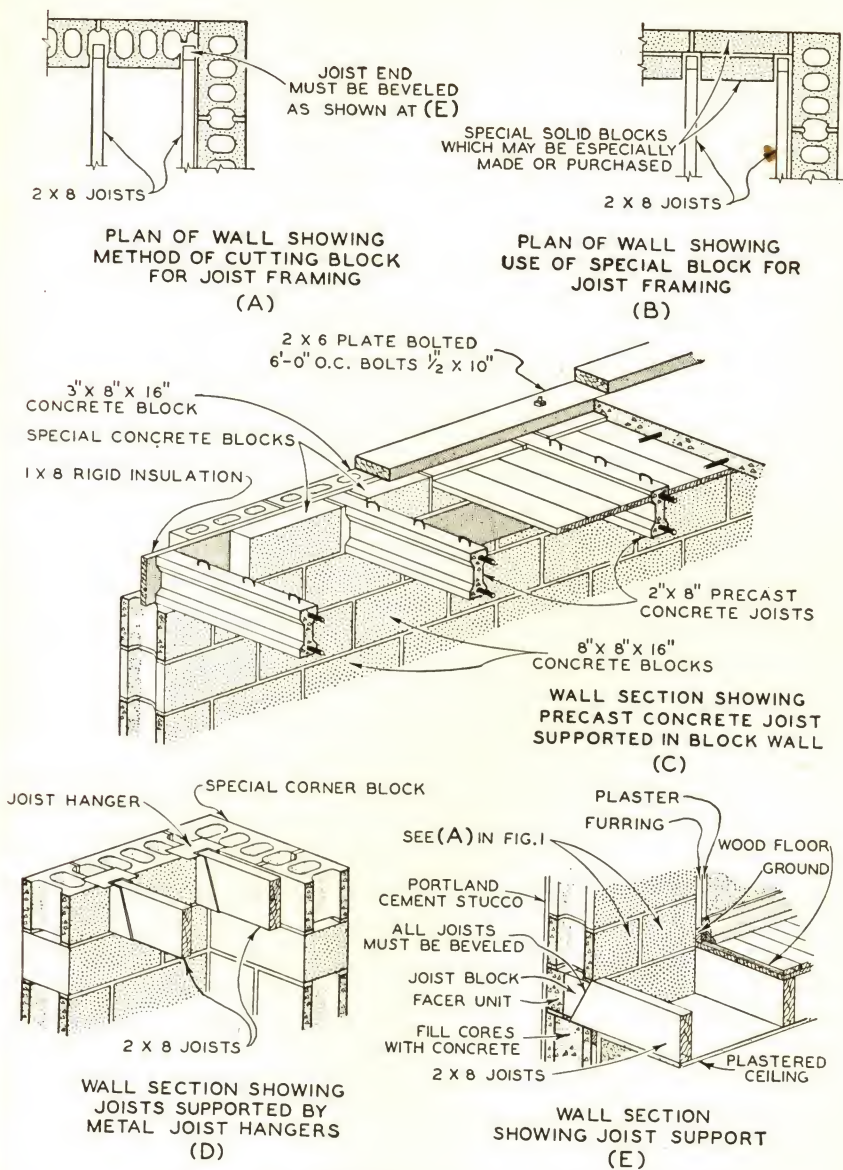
Details of Joist Bearing in Concrete Masonry Walls
